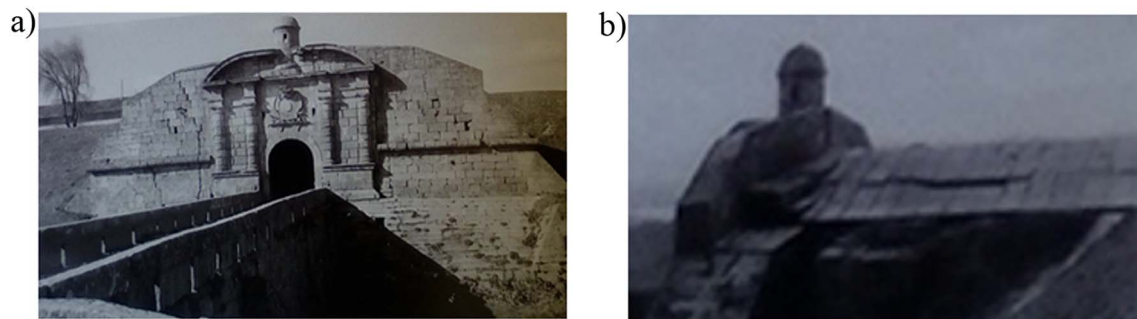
State of damage in the Master Gate of San Francisco in 1962: (a) façade B with vertical cracks and loss of material; and (b) crack on the roofing system (stone roof).
